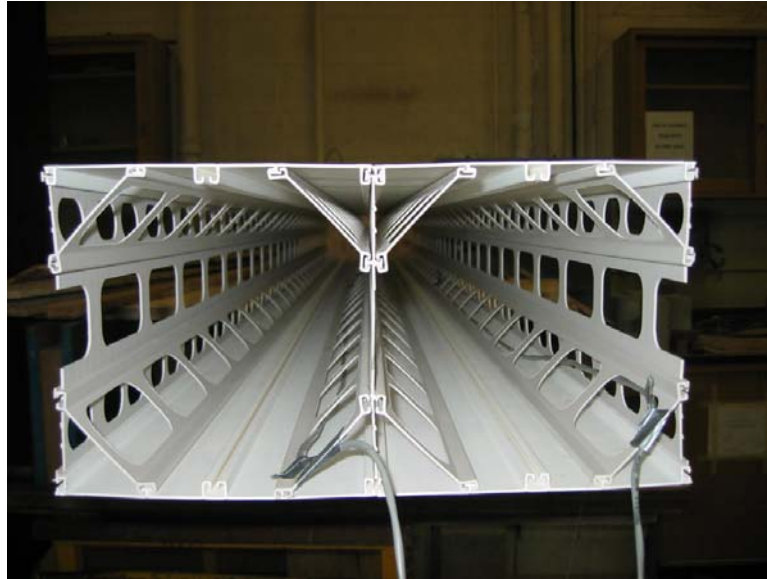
Cross section of a wall specimen with inclined connectors (Specimen D6I)
